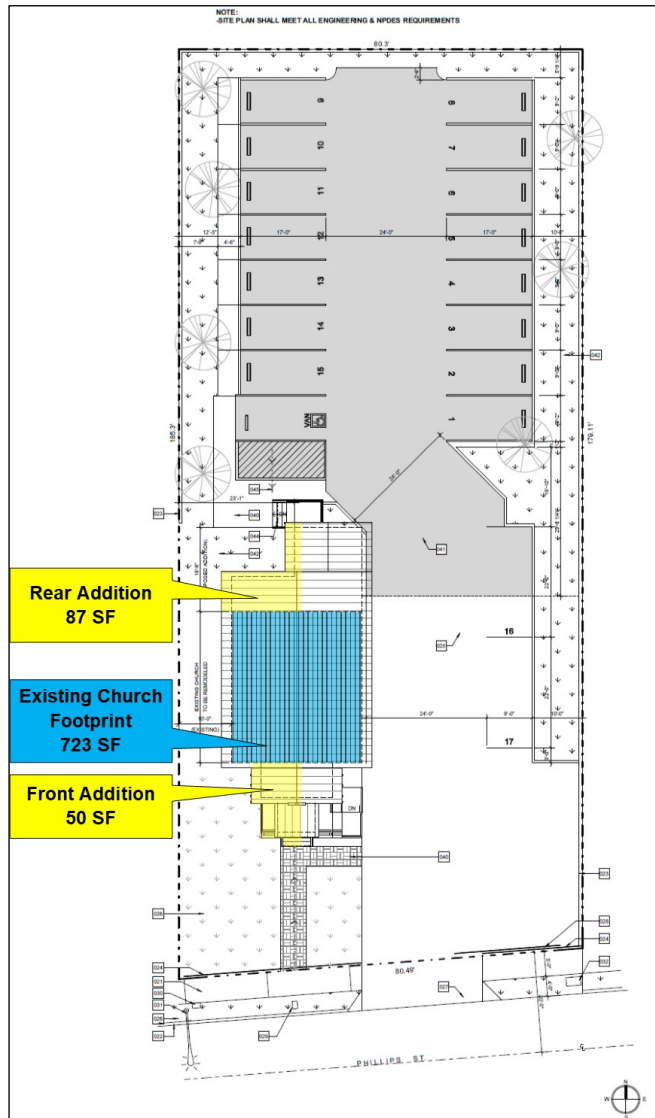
Proposed Site Plan Showing Portions of Building Within the Set Yard Setback Area
